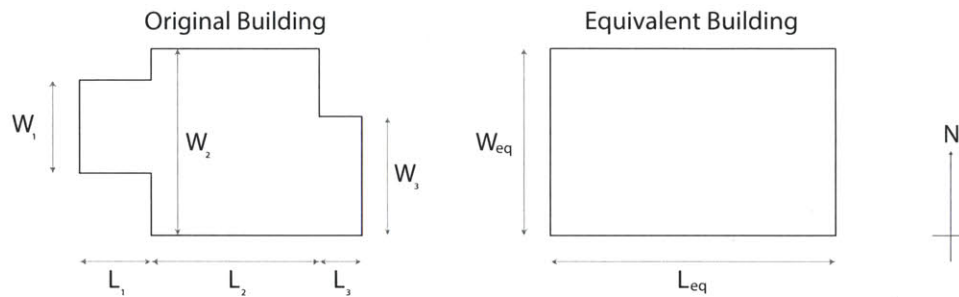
Determination of Cube Footprint from Example Irregular Floor Plan
